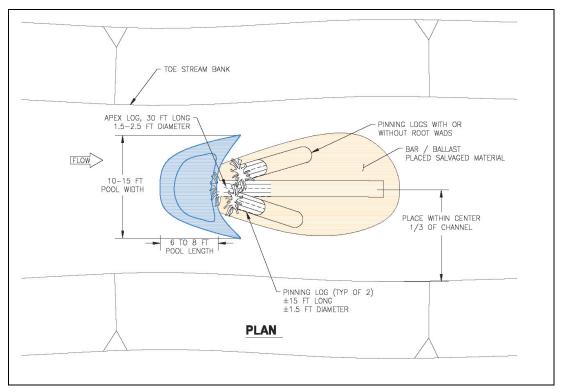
Design drawing of an Apex Jam with anchoring.
